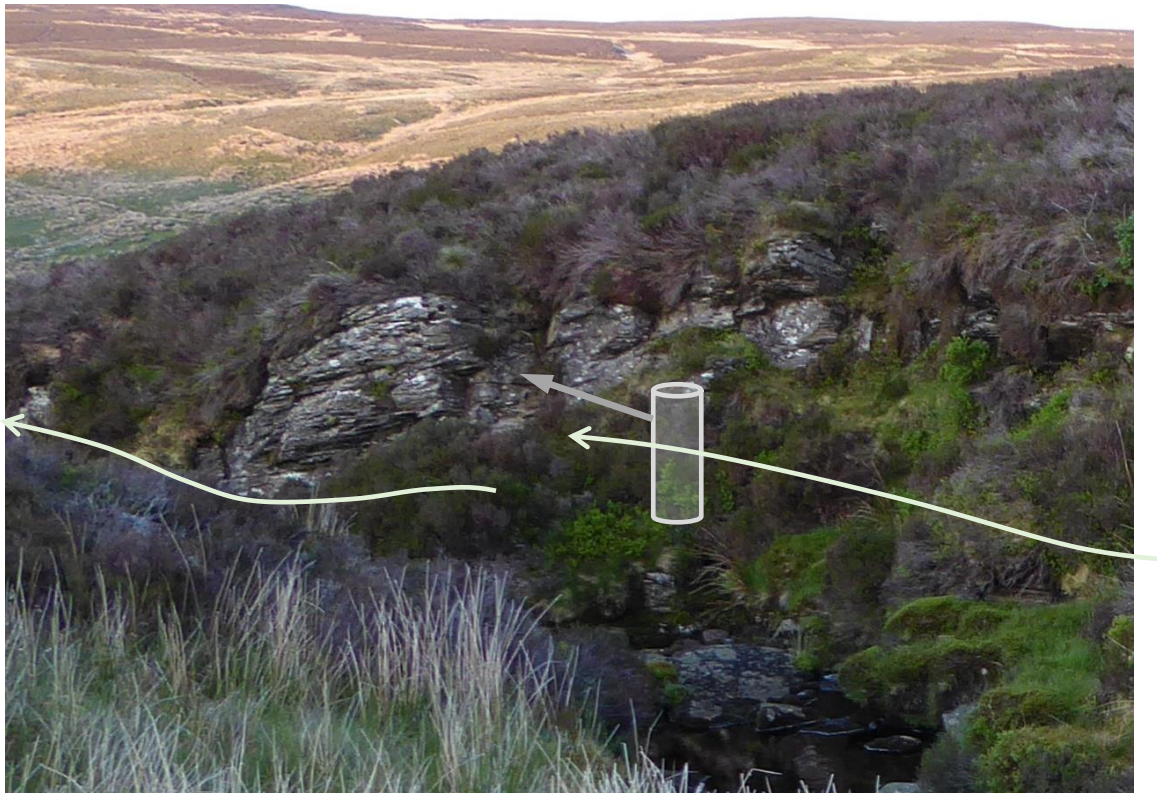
The settling tank will be bolted into a cleft in the rock face.
